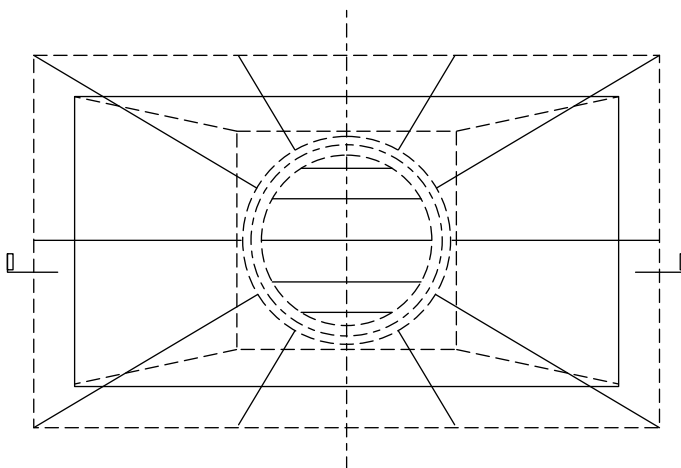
Plan Showing Bracket and Beam Arrangement.
